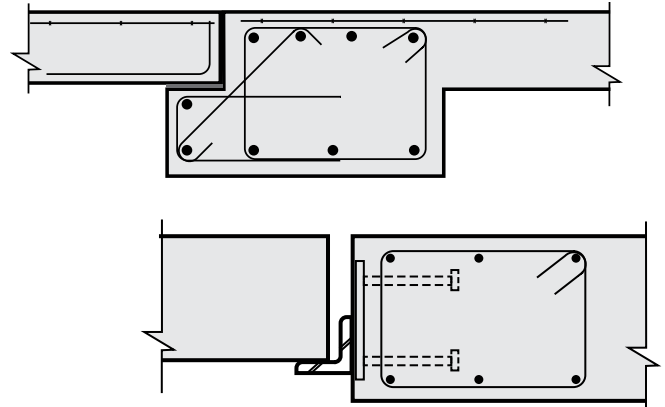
Examples of expansion joint details for PT construction. If required to maintain a diaphragm, reinforcing bars with slip connectors can be included and grouted after initial shrinkage is complete.
